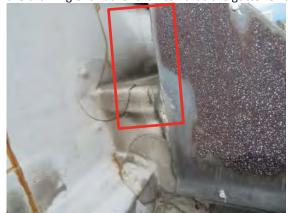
Photo depicts area where either a sloped "kick in" flashing should be installed, or better yet a re-sloping of the gutter trough during the upcoming reroofing so as to direct water away from the vulnerable parapet-to-gutter termination intersection.
